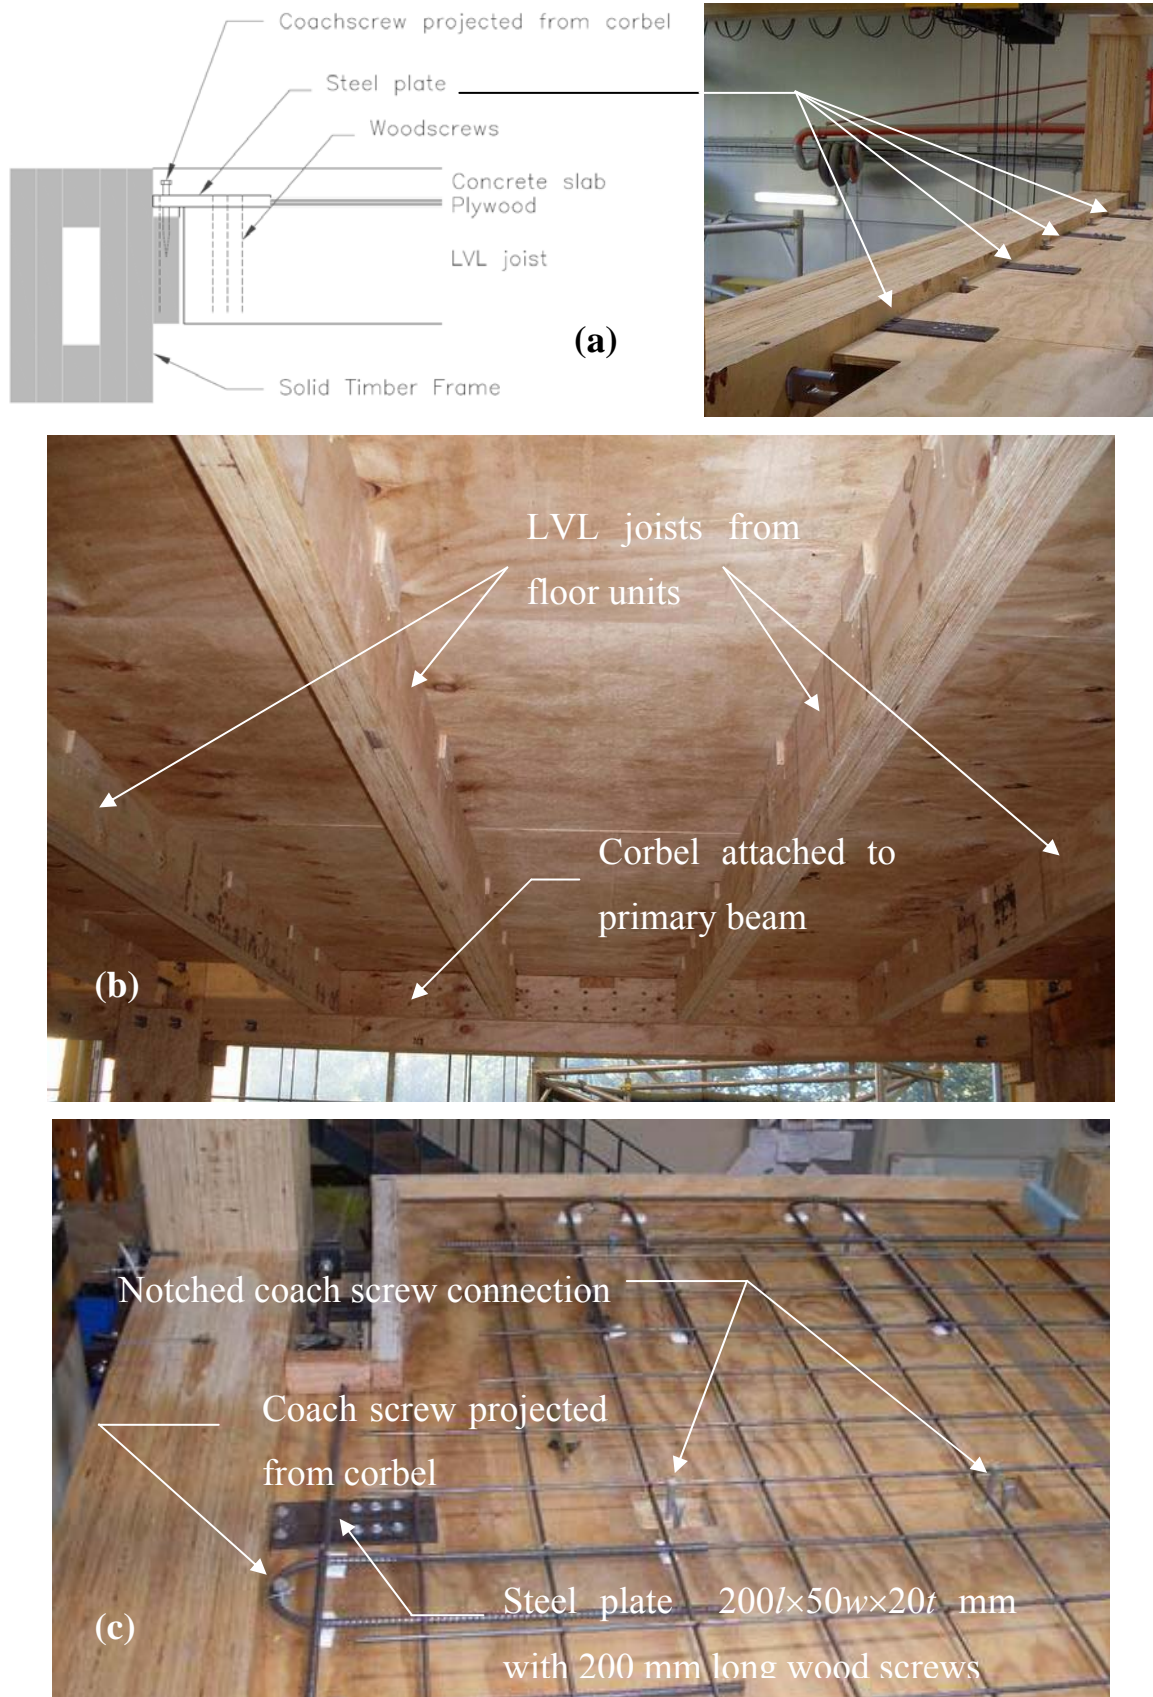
Support connection details: (a) Schematic diagram; (b) Underside of floor units sitting on corbel; and (c) Floor unit with details of 20 mm thick steel plate locked onto corbel
